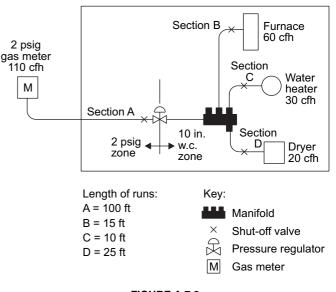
PIPING PLAN SHOWING A CSST SYSTEM
